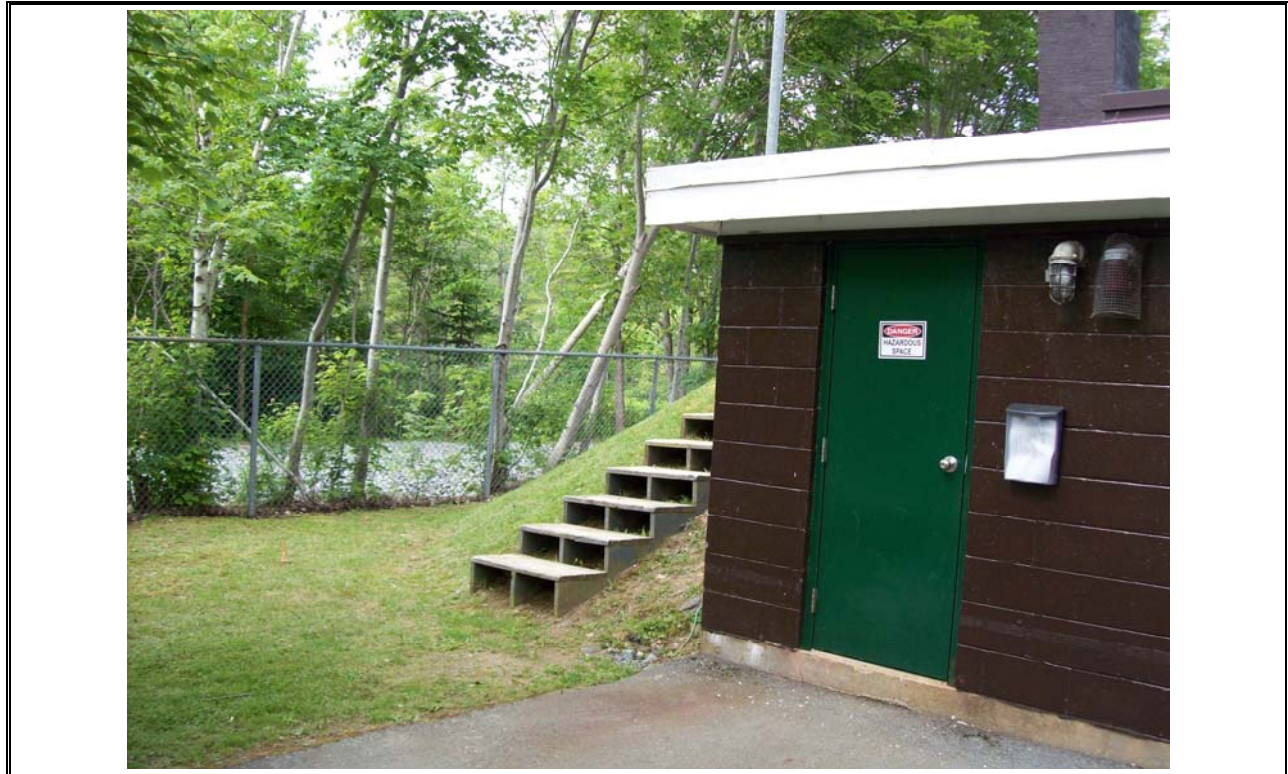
Wellington Blower Building and Stairs to Package Treatment Plant
